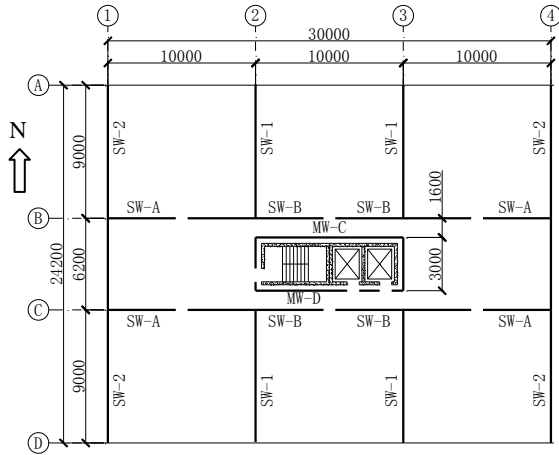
Layout of the hybrid building containing wood shear walls (SW) and masonry walls (MW).
